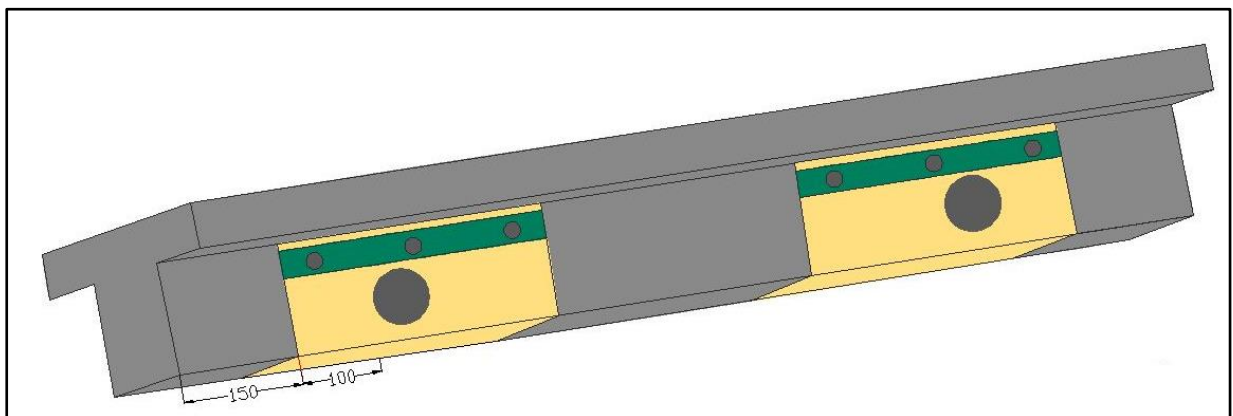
Model of beam with 4 layers of BFRP U-wrap in  $90^0$  orientation with circular web openings and anchorage system (SB14)
